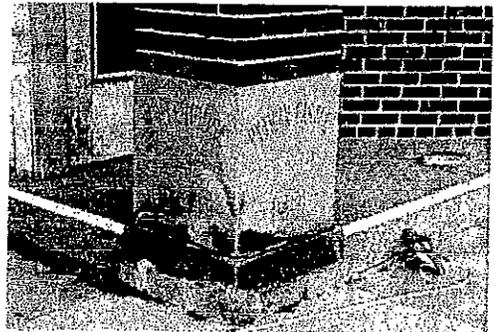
Corner Stone of the Pythian Castle in White house (South west corner of building)
